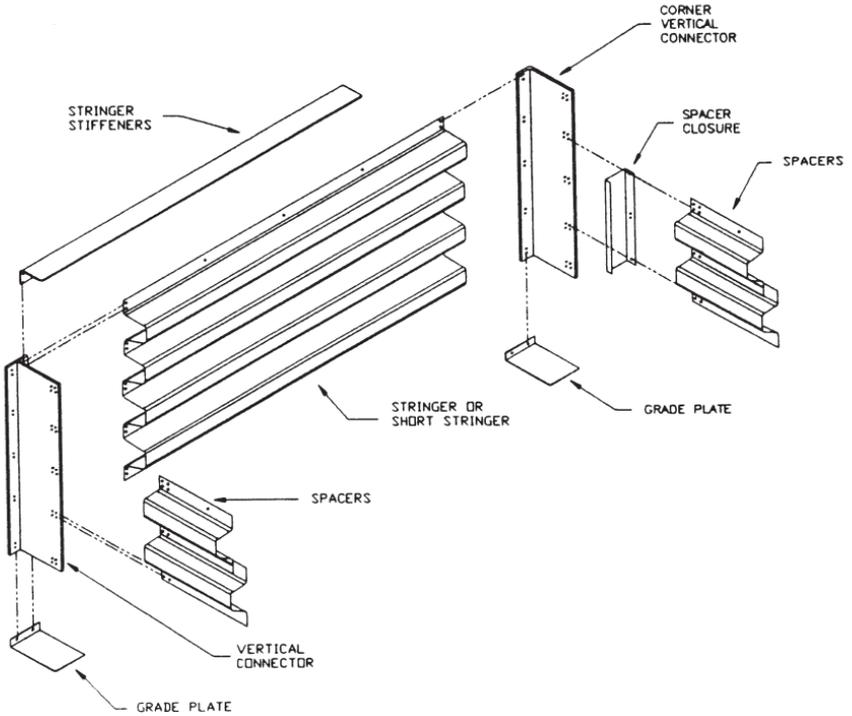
Exploded view of front panel joint of Type II steel binwall as seen from the inside.
